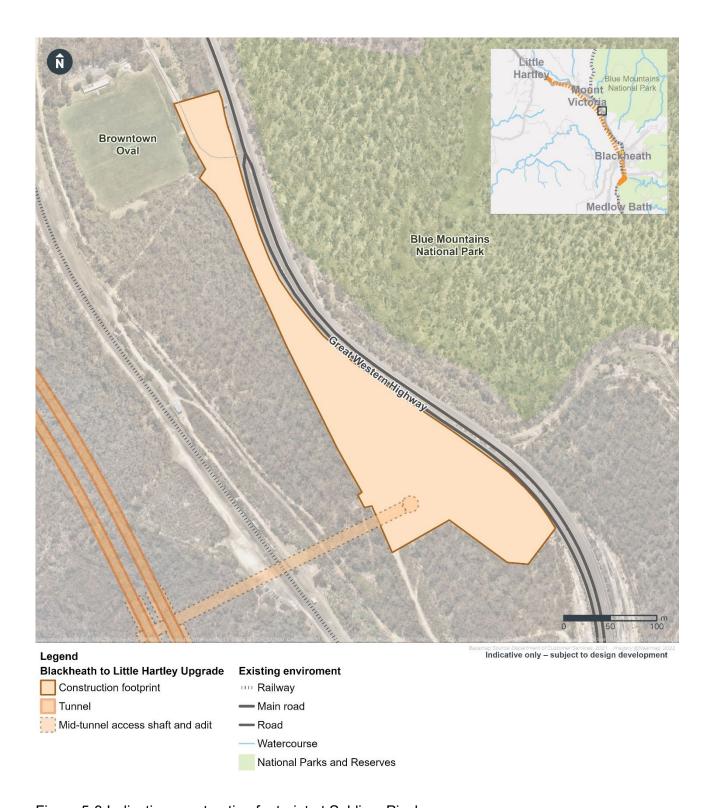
Indicative construction footprint at Soldiers Pinch
